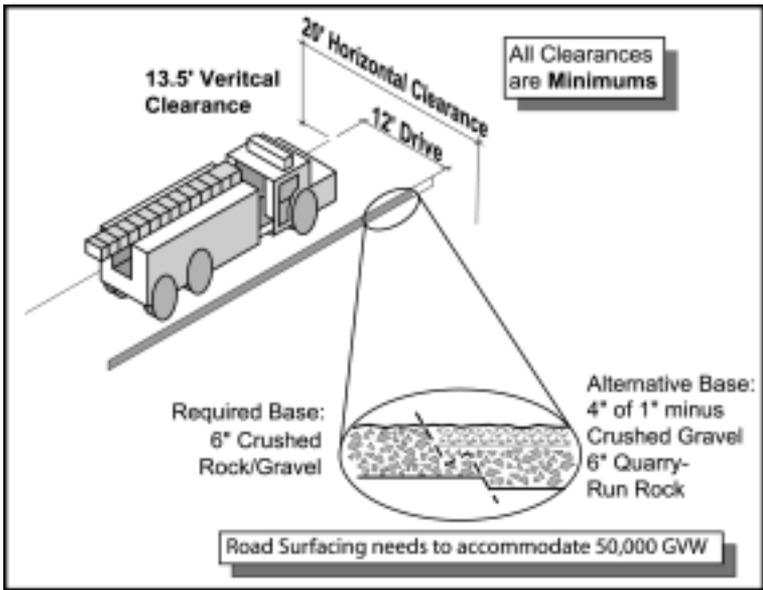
Minimum construction standards for access: road construction specifications (LCC 935.200).
